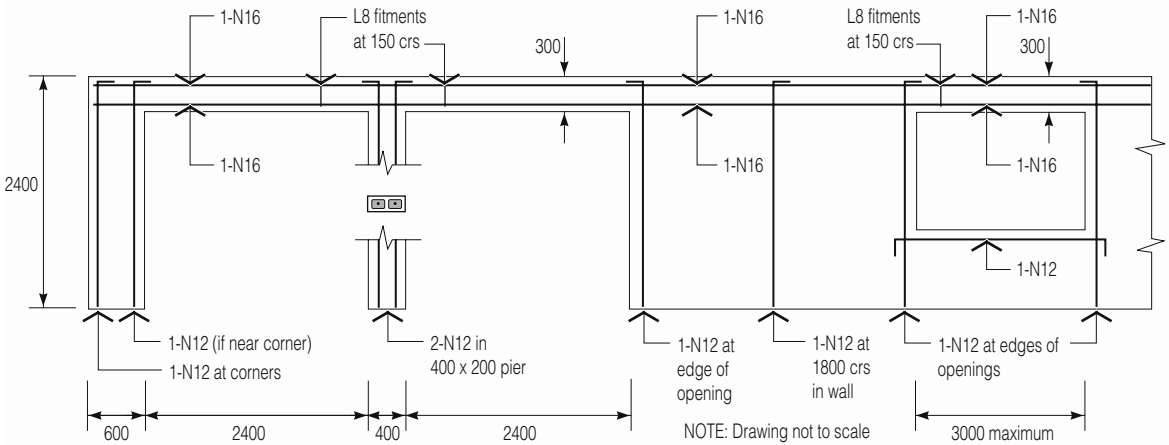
Wall Reinforcement for 190-mm Leaf for Wind Classifications N4 and C1 and 2400-mm Wall Height
